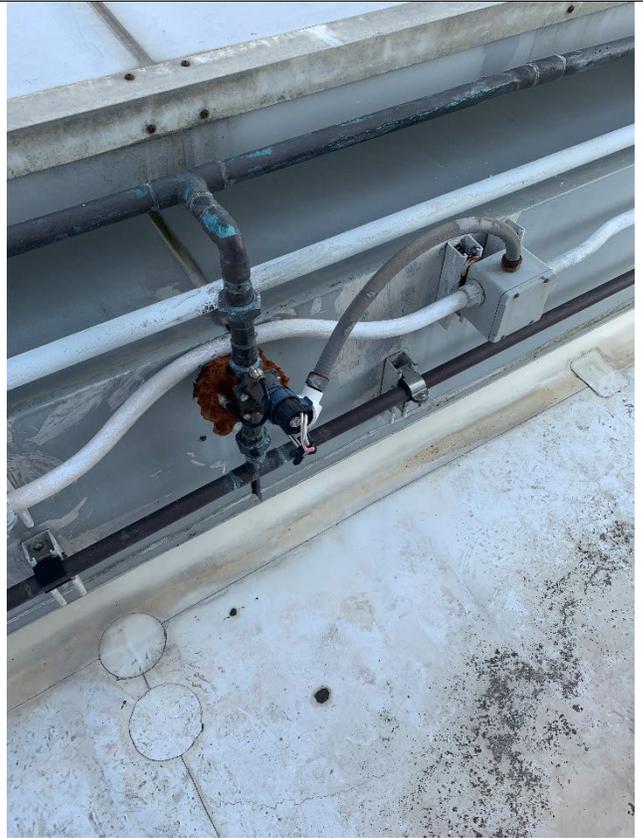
Typical Arrangement of Exterior Copper Piping and Sprinkler Solenoid. T Split in piping is for two heads on one zone. All new Piping shall be insulated and covered with Aluminum Jacket. Electrical Junction boxes may be reused, however all new liquidtight metal flex shall be used.
